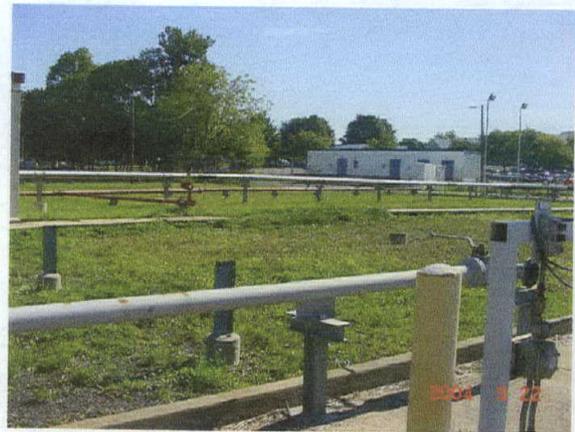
Looking southeast at current fuel tanks in concrete and a portion of the location of former Tank 115 (grass over concrete slab).
